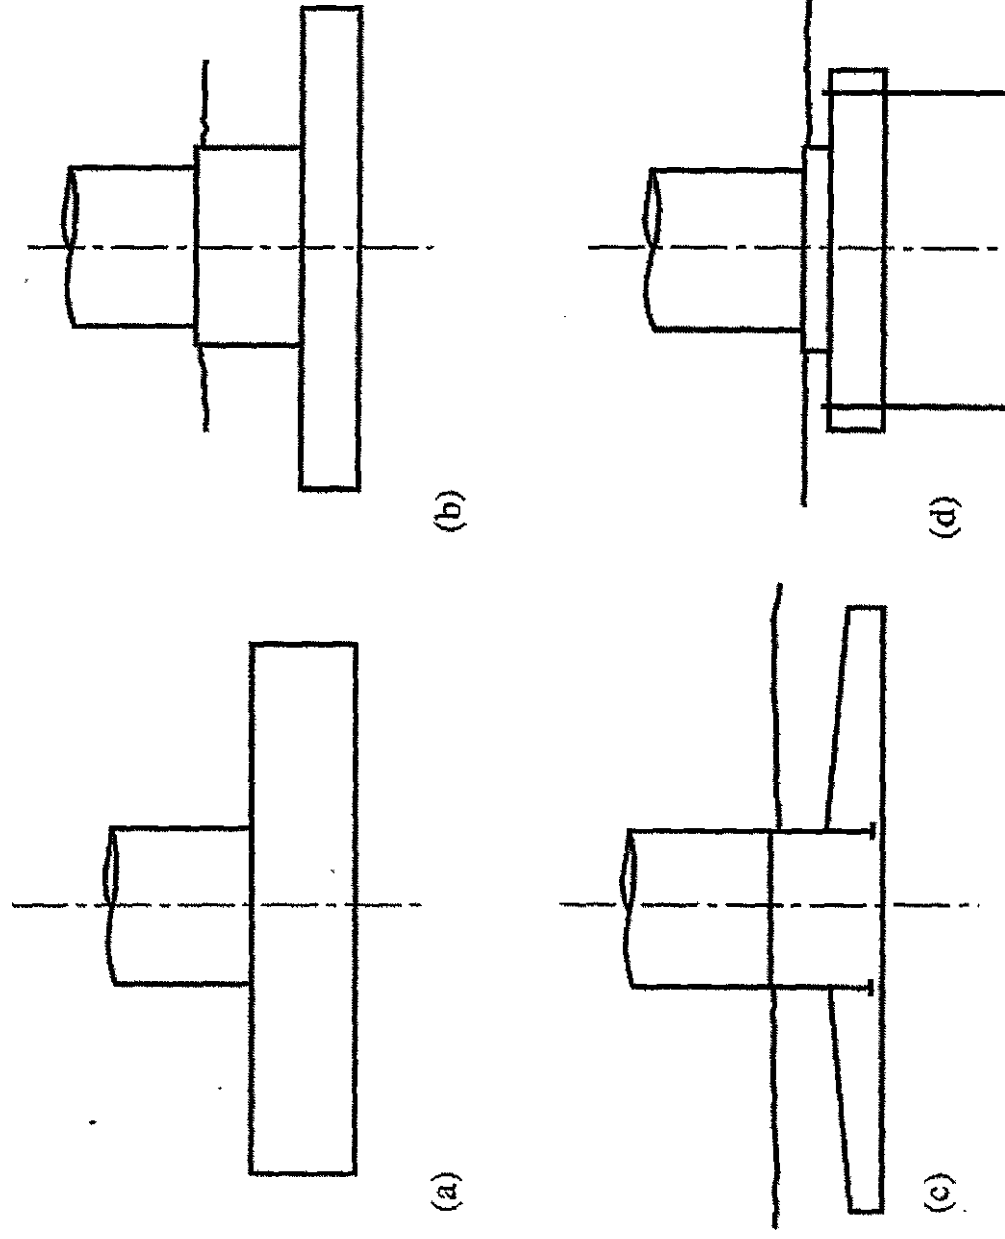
(a) Plain Slab; (b) Stub and Pedestal; (c) Stub Tower Embedded in Tapered Slab; (d) Slab Held Down by Rock Anchors
